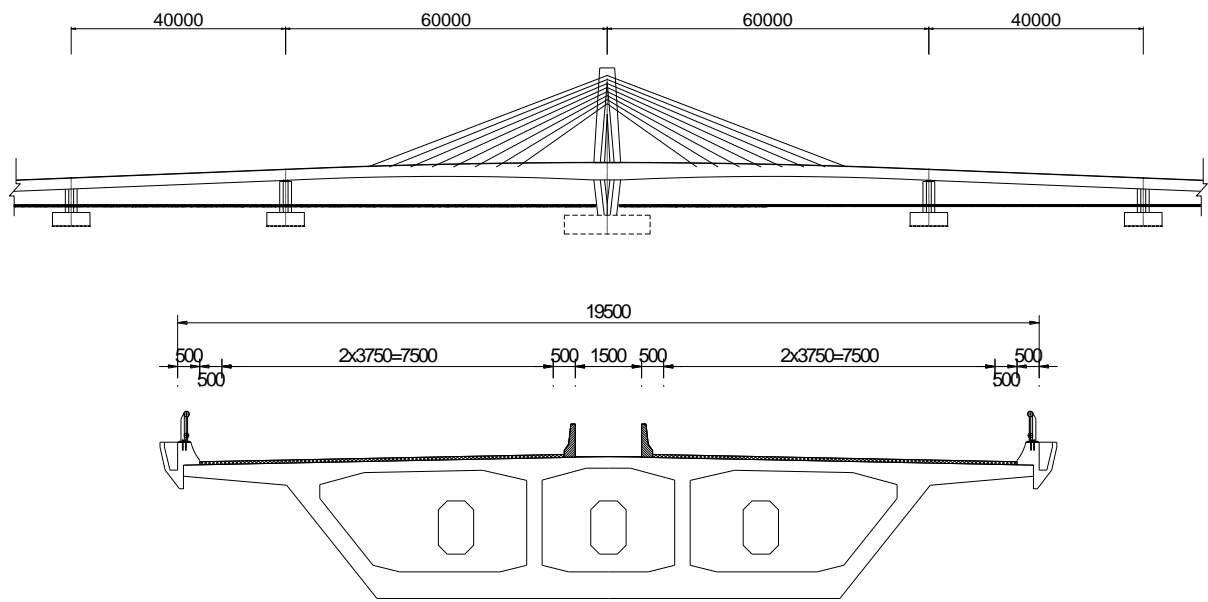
A profile and cross-section of the bridge (Note: Unit is mm)
